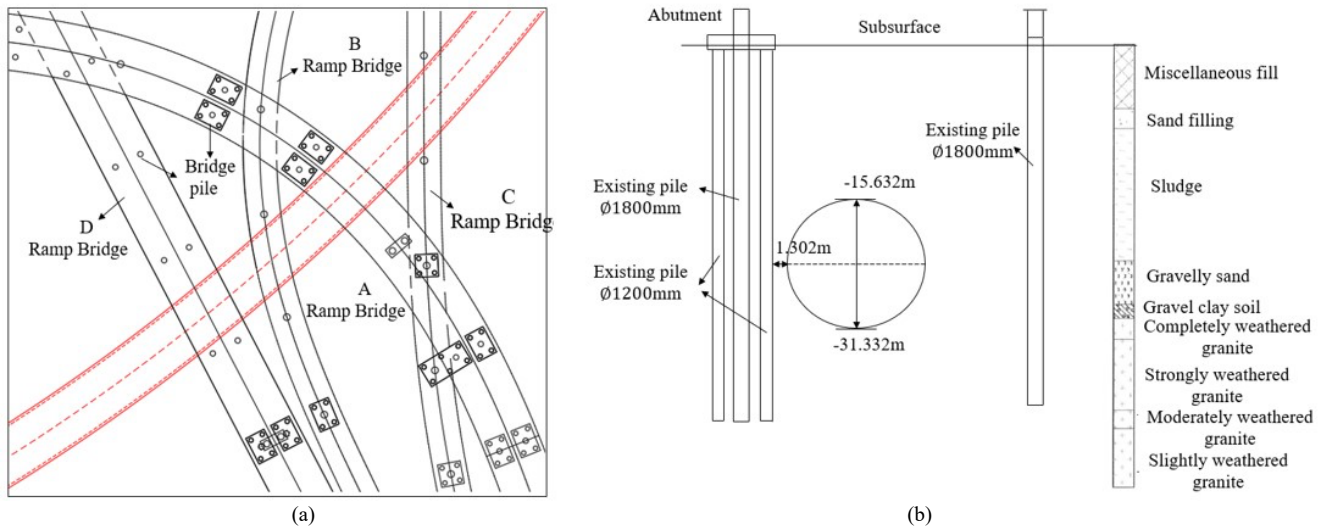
Relationship between Wanghai Road tunnel and bridge and pile foundation.
